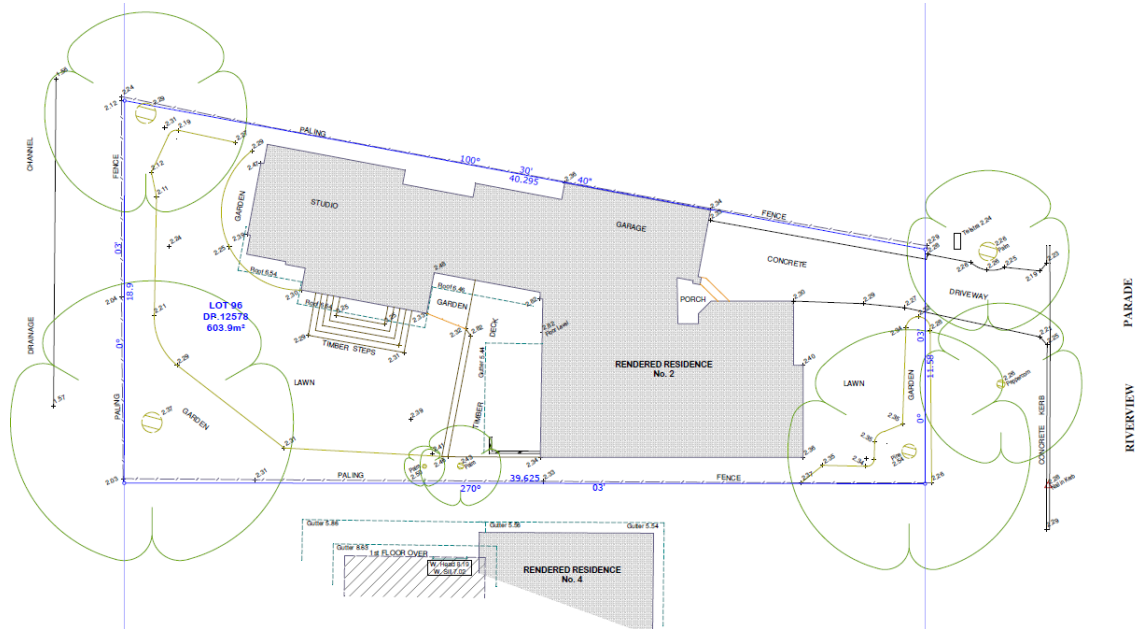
Survey Plan (Source: Landscape Surveys)
